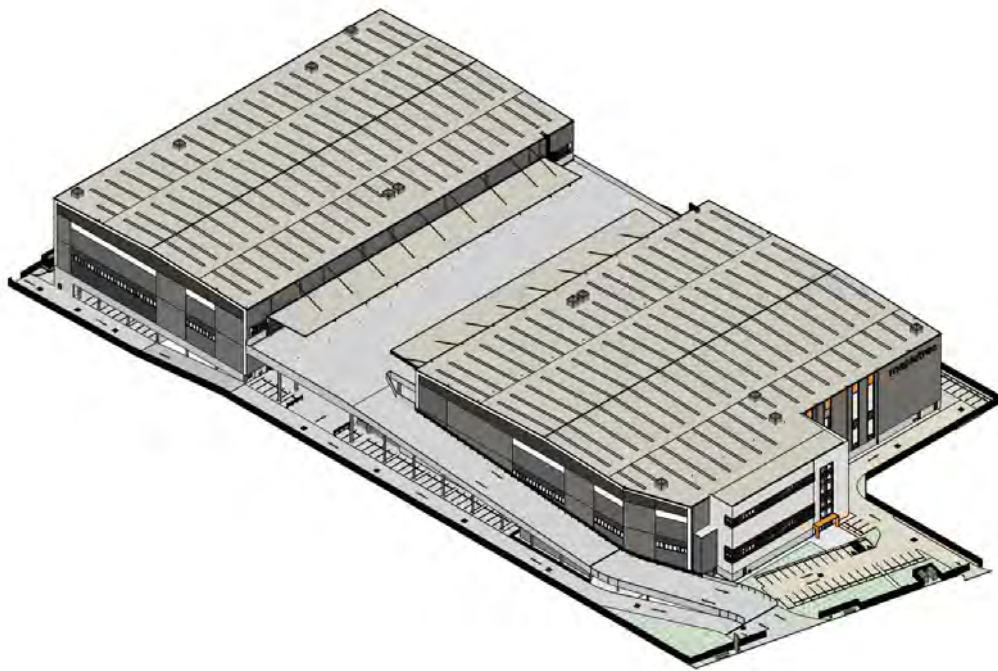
Proposed Development – Artists Impression Only (Source: Pace Architects)
